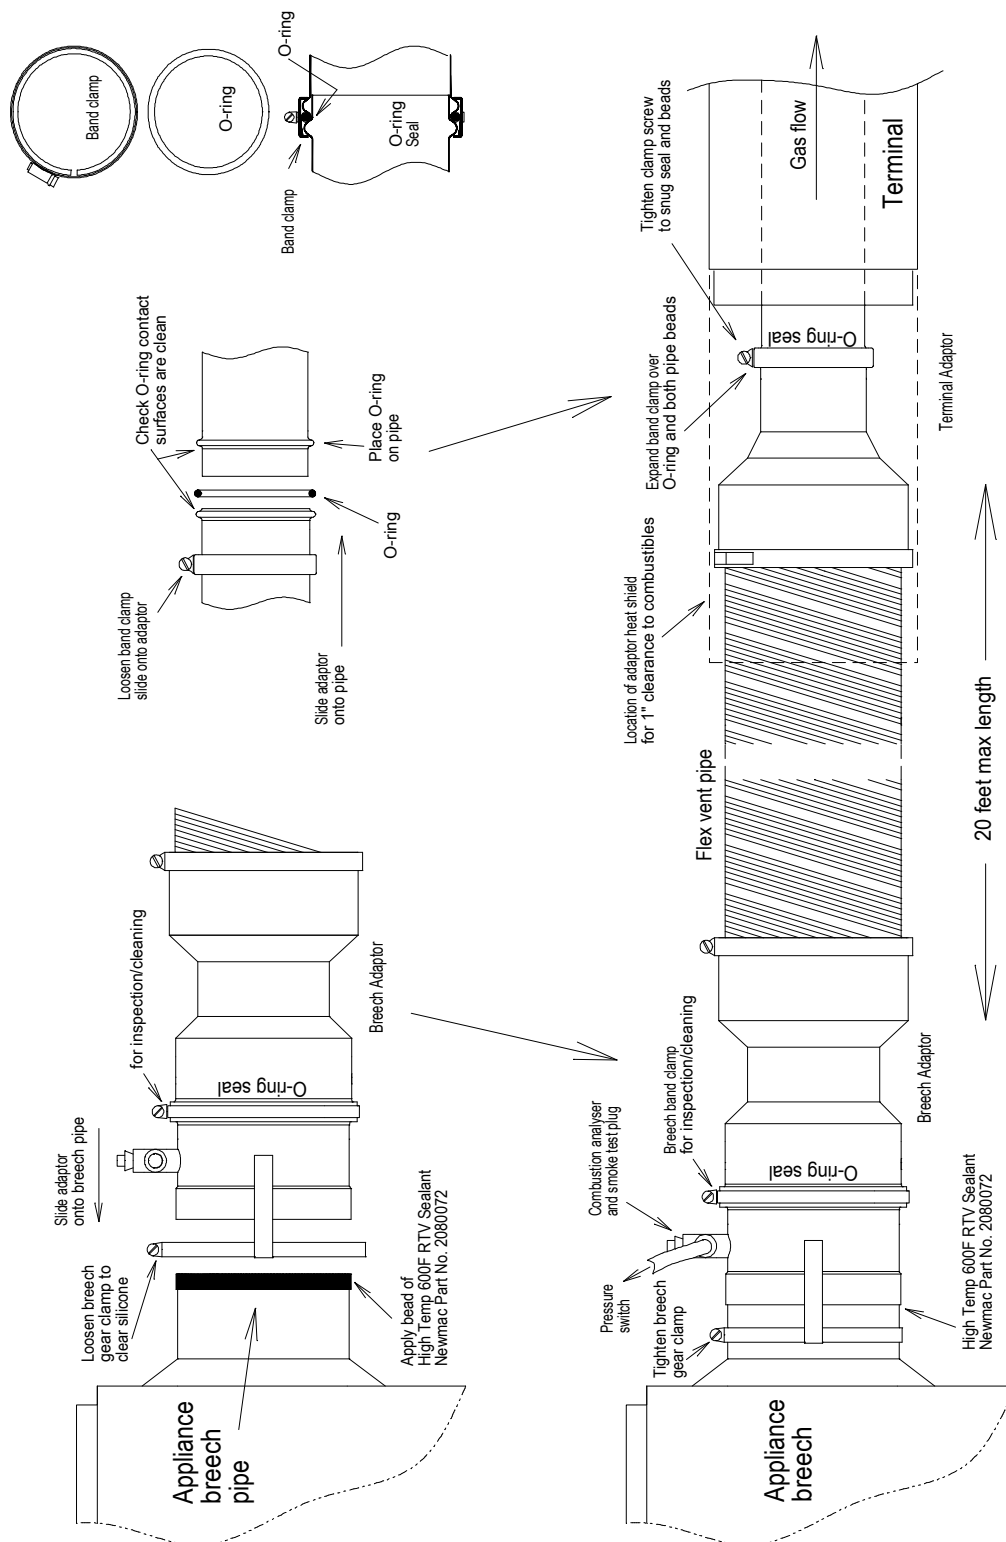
, INSTALLED FLEX VENT ASSEMBLY
